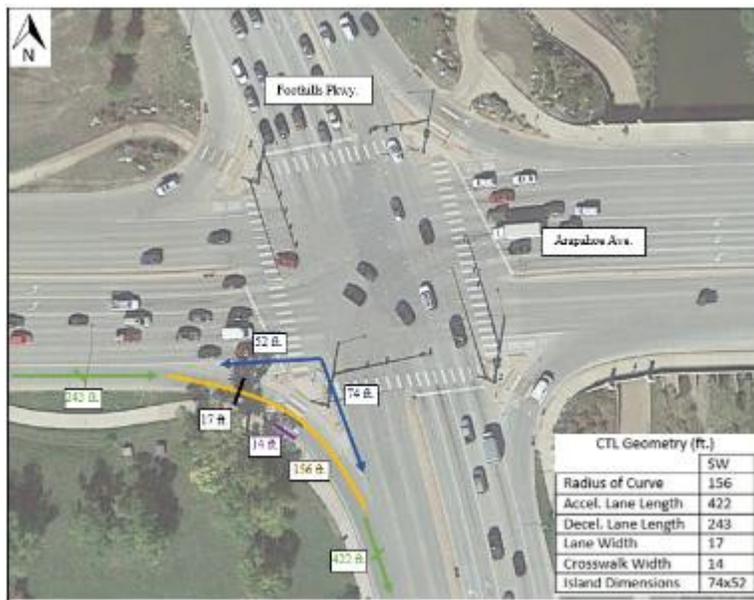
CTL at Foothills Parkway and Arapahoe Avenue, Boulder, CO
